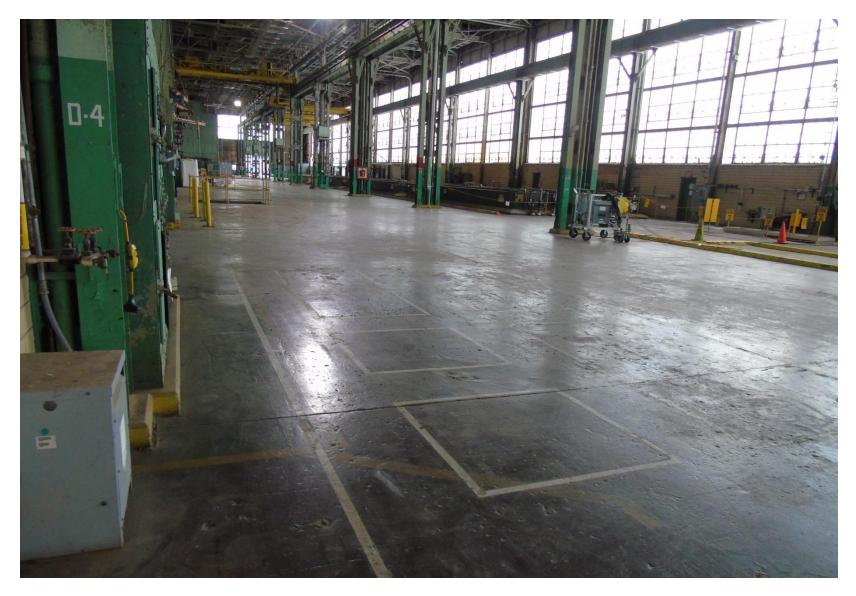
East Side Interior of the C-400 Cleaning Building Facing North (2017)
